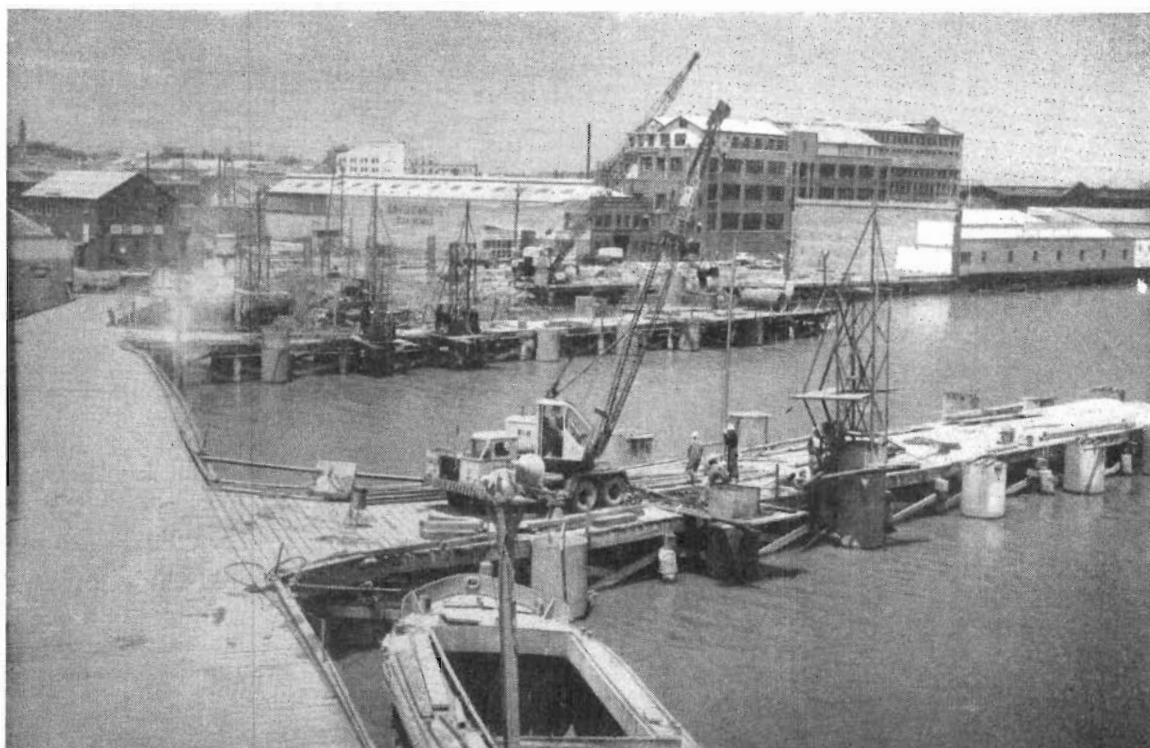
King-street Bridge Project—Timber Access Bridge.
